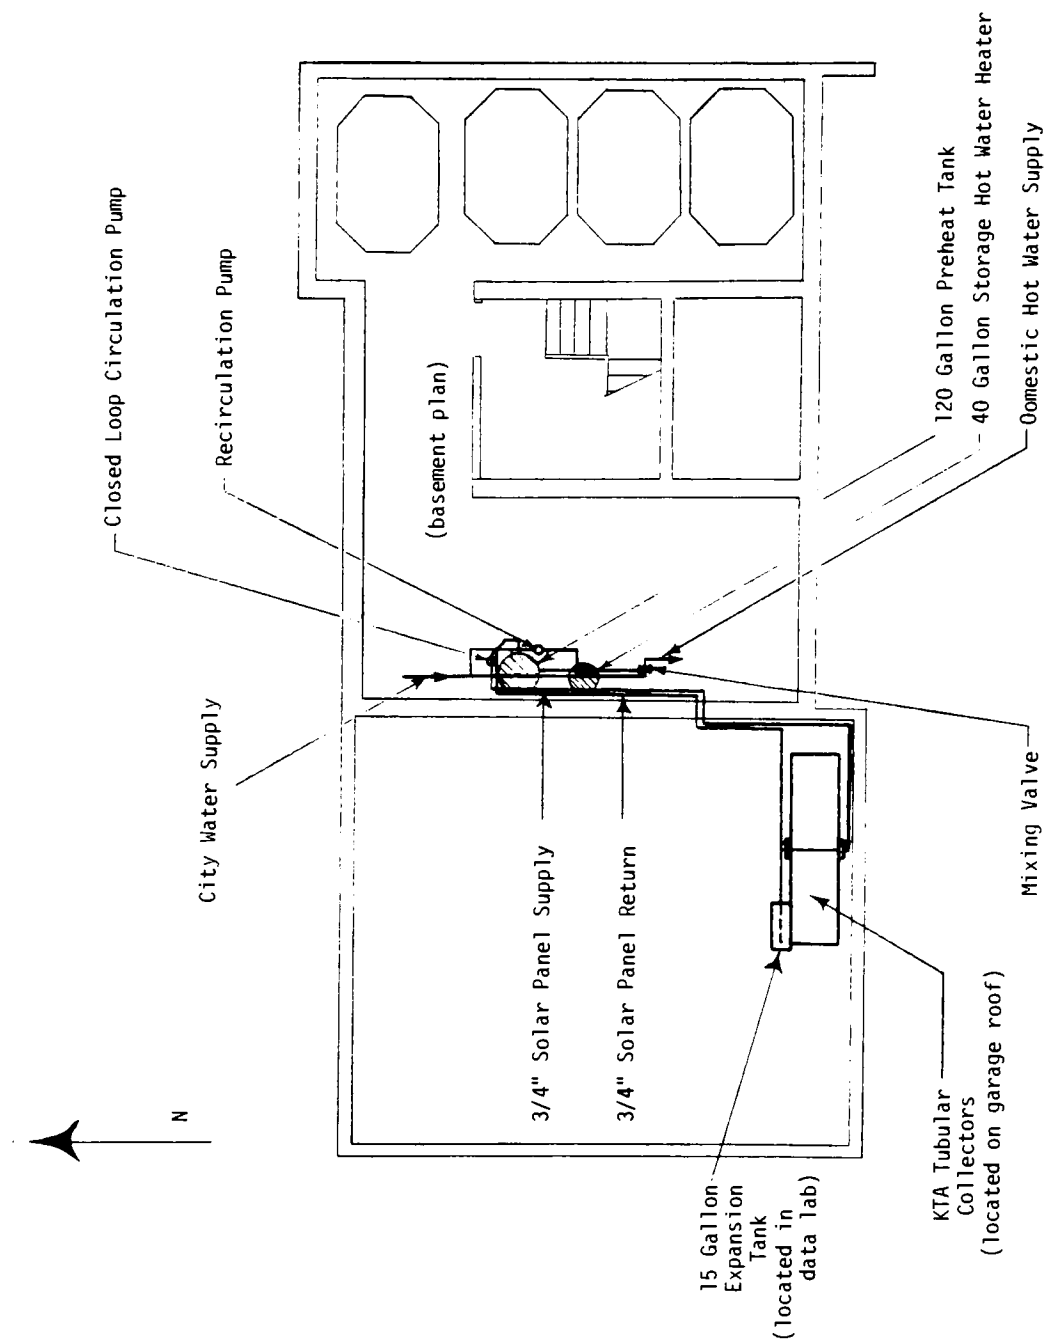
Actual Solar Water Heating System Layout - Plan View
